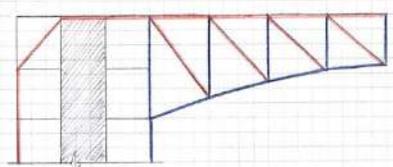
The truss scheme adopted for the cantilever beam. Minimum thickness is 10 m. Blue indicates compressed elements, red indicates the ones subject to tension.
